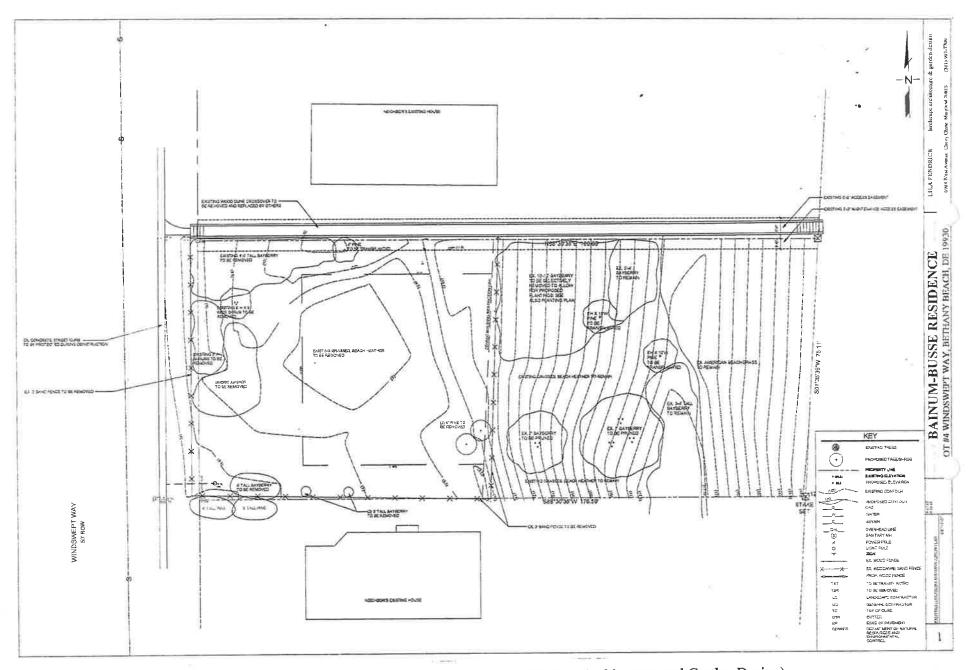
Landscaping plan (prepared by Lila Frederick, Landscape Architecture and Garden Design).
